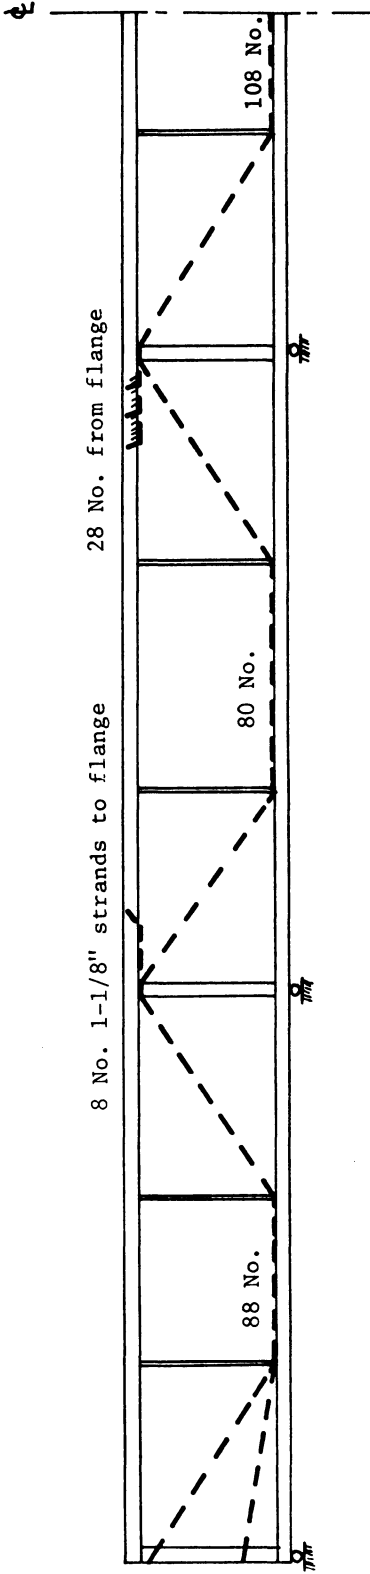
Commonwealth Avenue Bridge — longitudinal cable profile.
